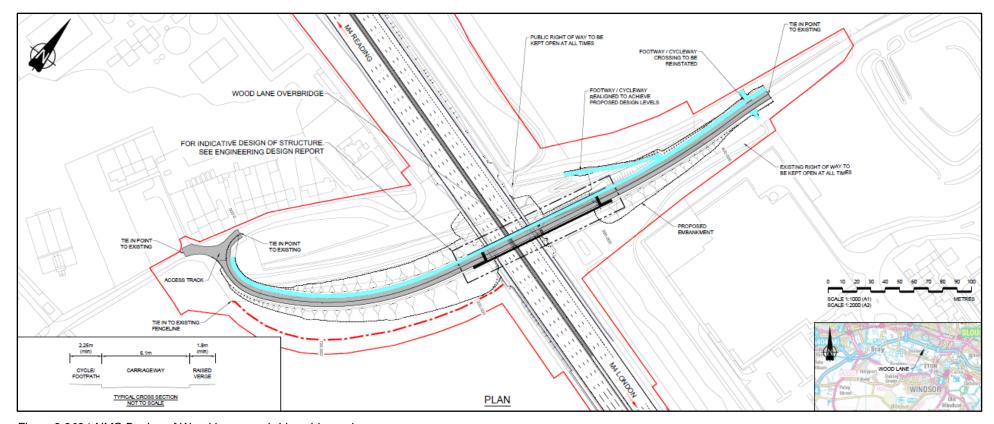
2021 NMC Design of Wood Lane overbridge side road
